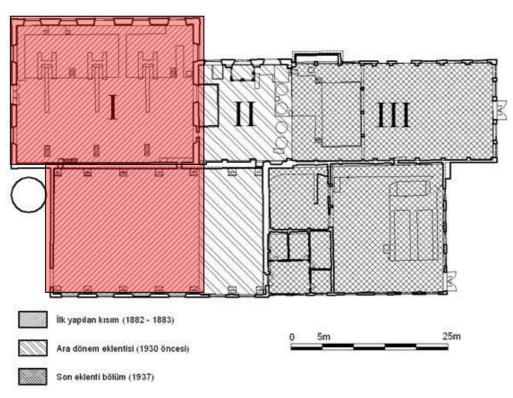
1. Terkos Water Pump Station Plan (Akatay, 2003)
